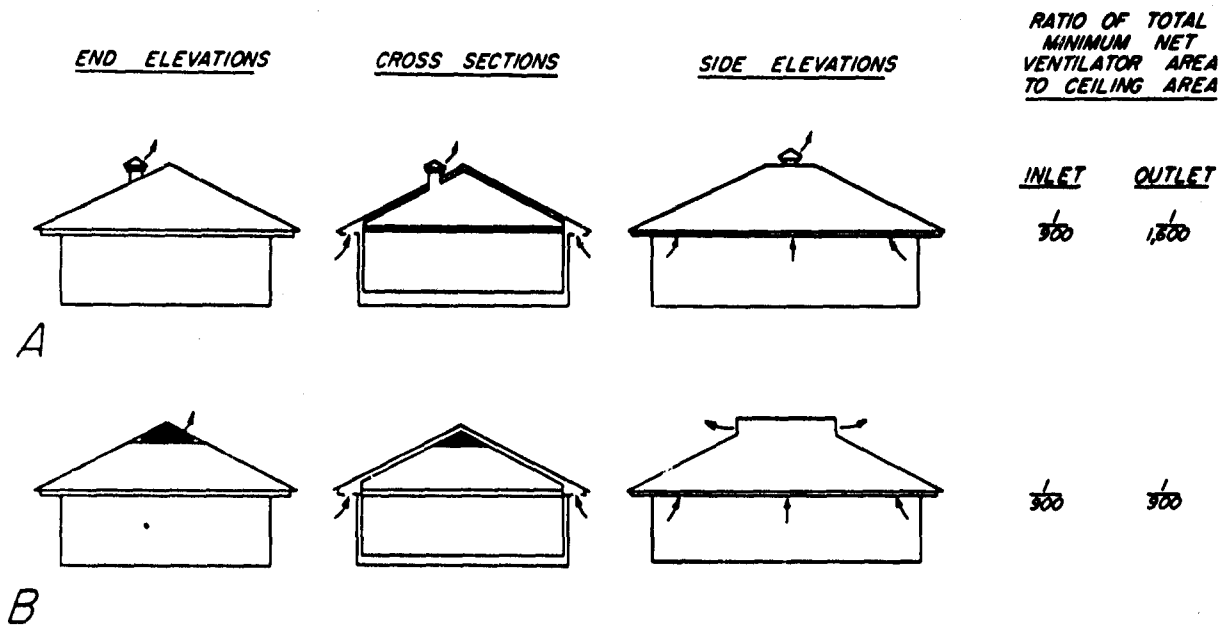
Ventilating areas of hip roofs: A, inlet openings beneath eaves and outlet vent near peak; B, inlet openings beneath eaves and ridge outlets. M 87626 F
